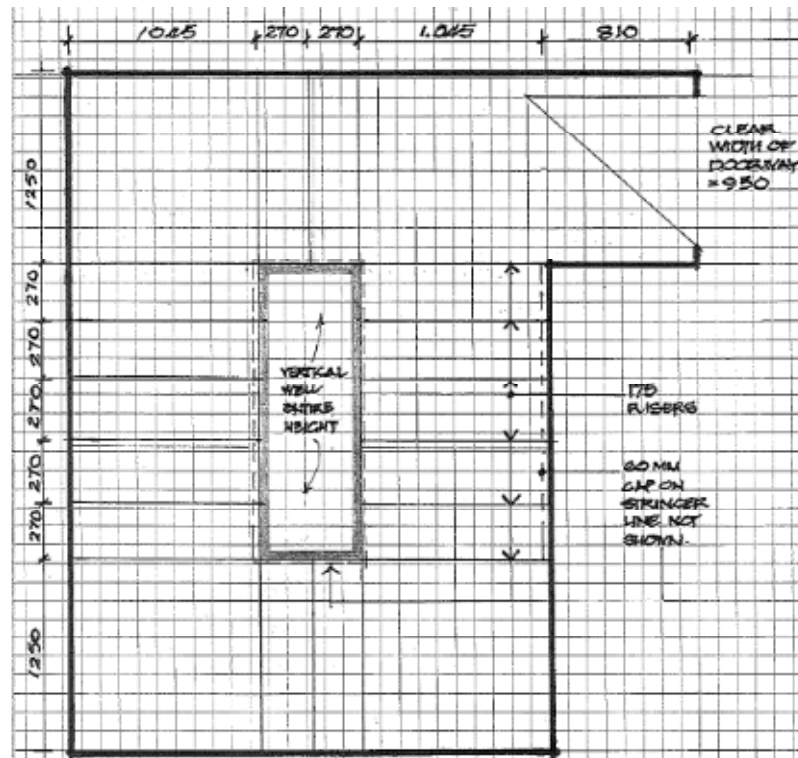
Unisys Building Stair Plan (MacLennan, 2011)
